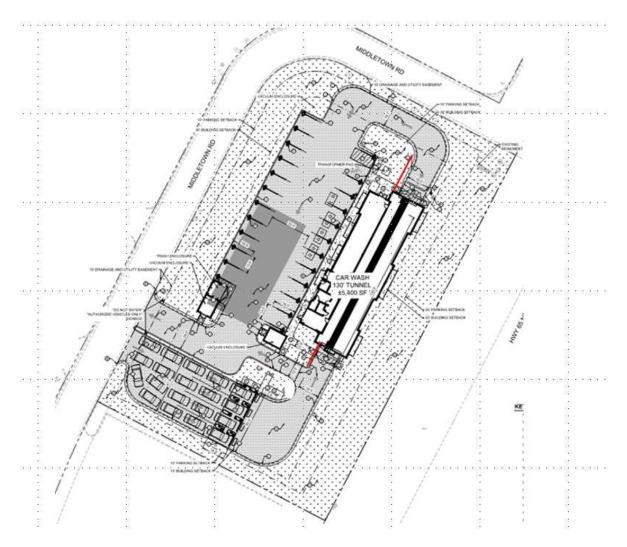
PROPOSED NOISE WALLS ON SITE PLAN
